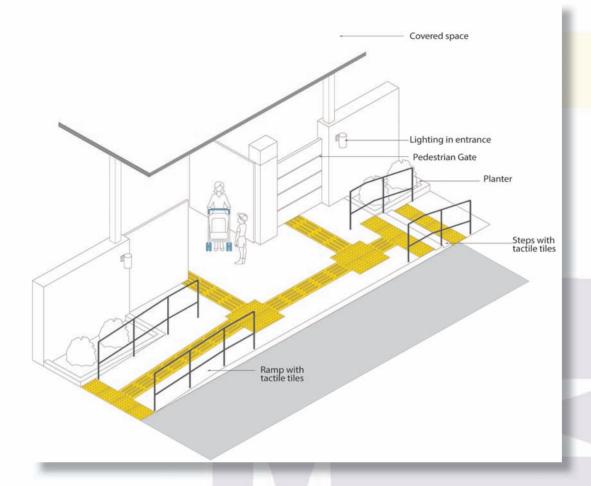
Configuration and Layout of Tactile Pavers: Guiding and Warning
